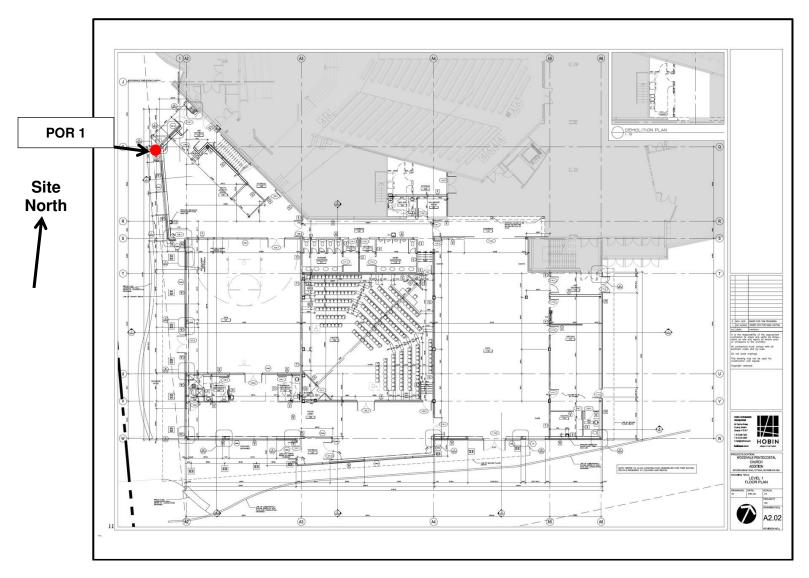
Second Floor Plan showing Points of Reception (Source: Hobin Architecture Inc.)
